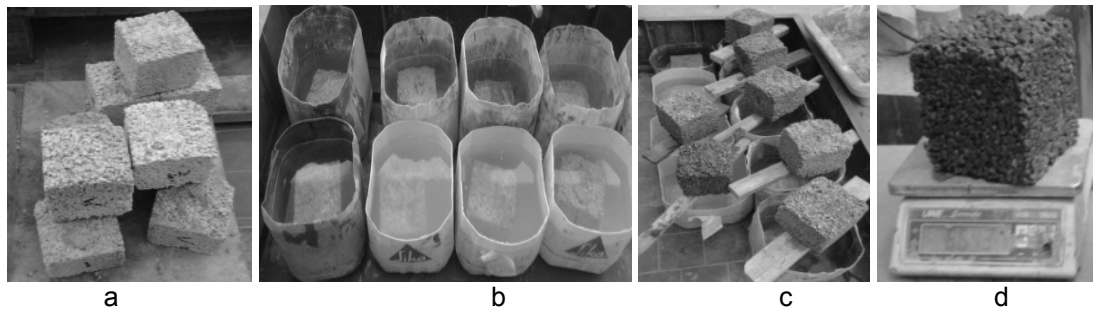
Porosity Test: a) Oven-dried Specimens, b) Specimens Submerged in Water, c) Specimens After Removal from Water and d) Weighing of Specimens
